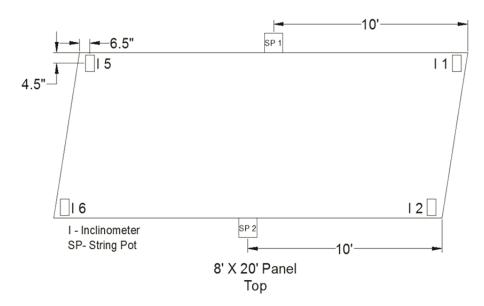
Inclinometer and String Potentiometer Layout for Testing Panel to Failure
